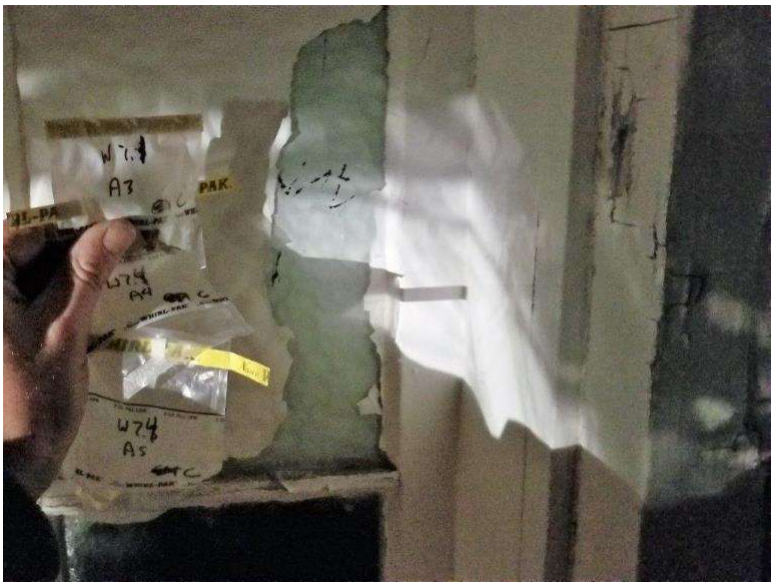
Site 7.4 Waterton Townsite Campground Washroom #9.
